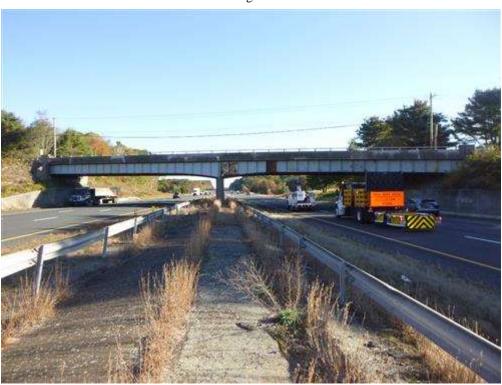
Photo Taken: 10/13/2023 West elevation of the bridge.
